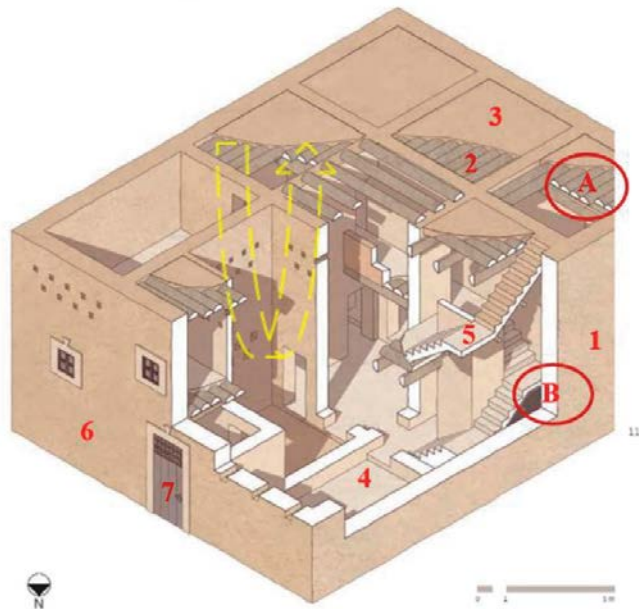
Perspective view of a traditional house (Calogero Montalbano, 2011)
